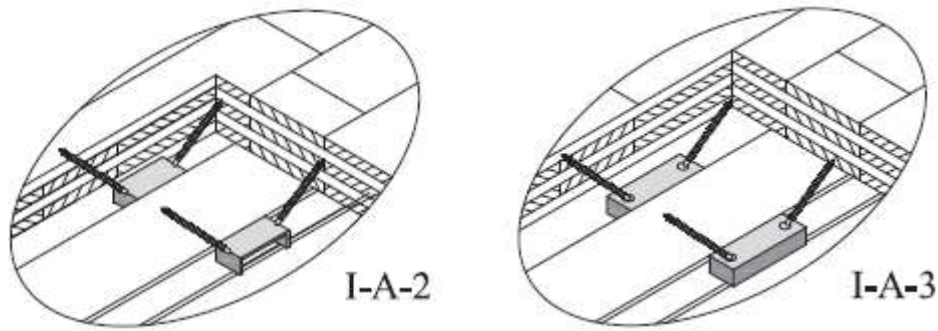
connection with self-tapping screw for a steel frame with CLT infills
